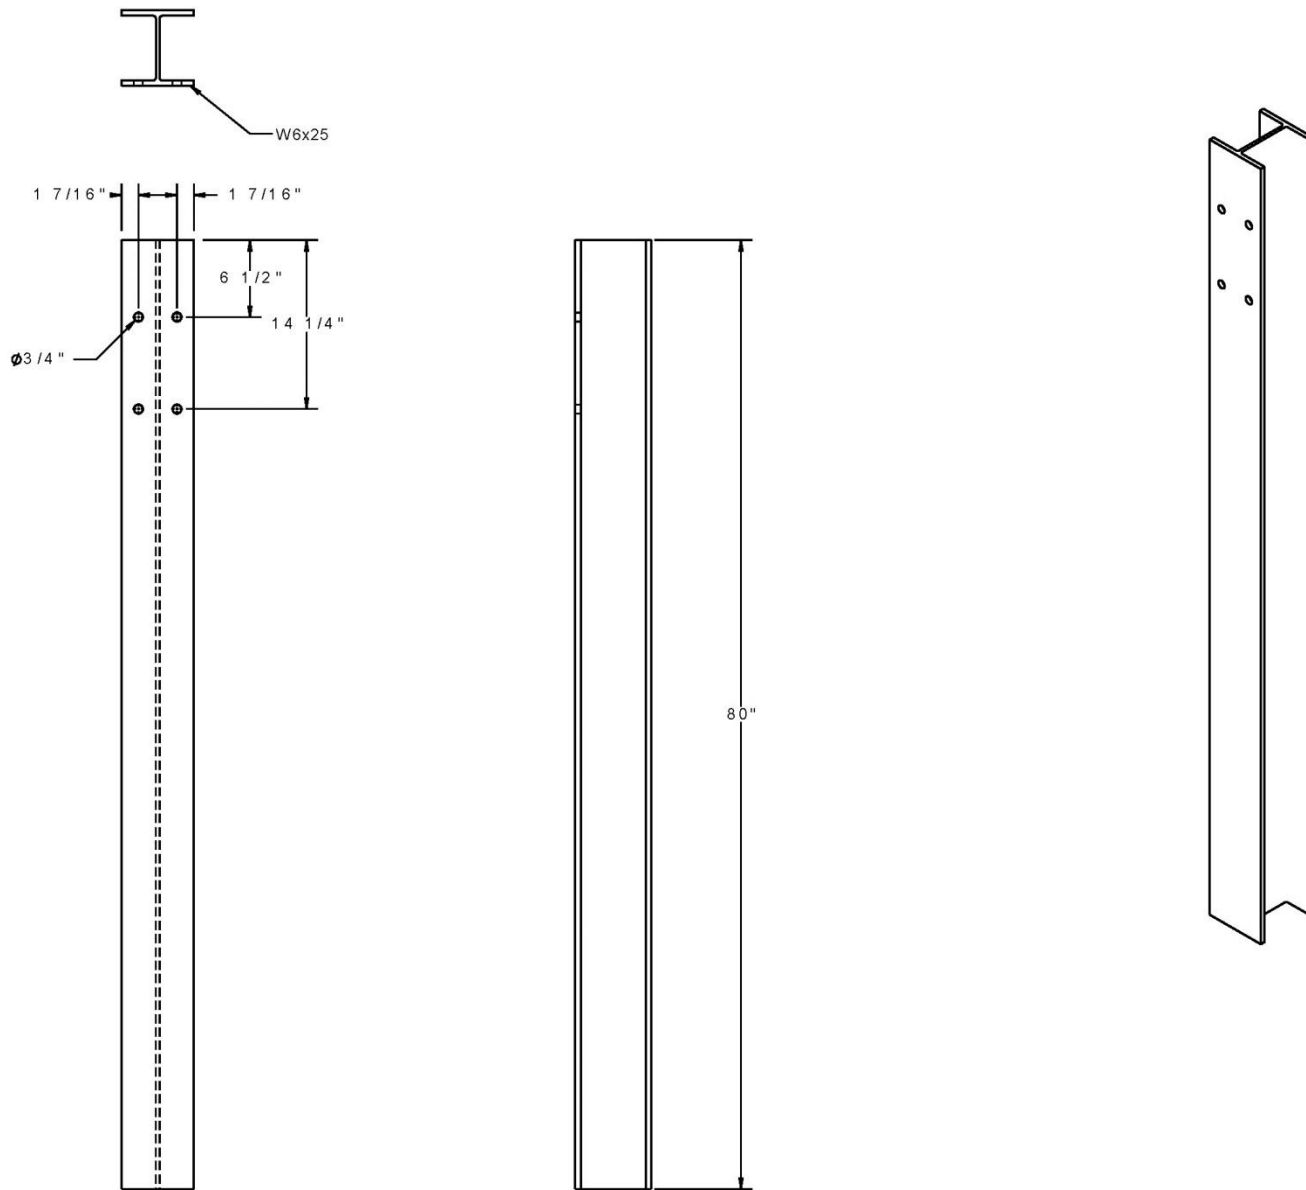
Stiff Bridge Rail Post Details, MwRSF Short Radius Design [14]
